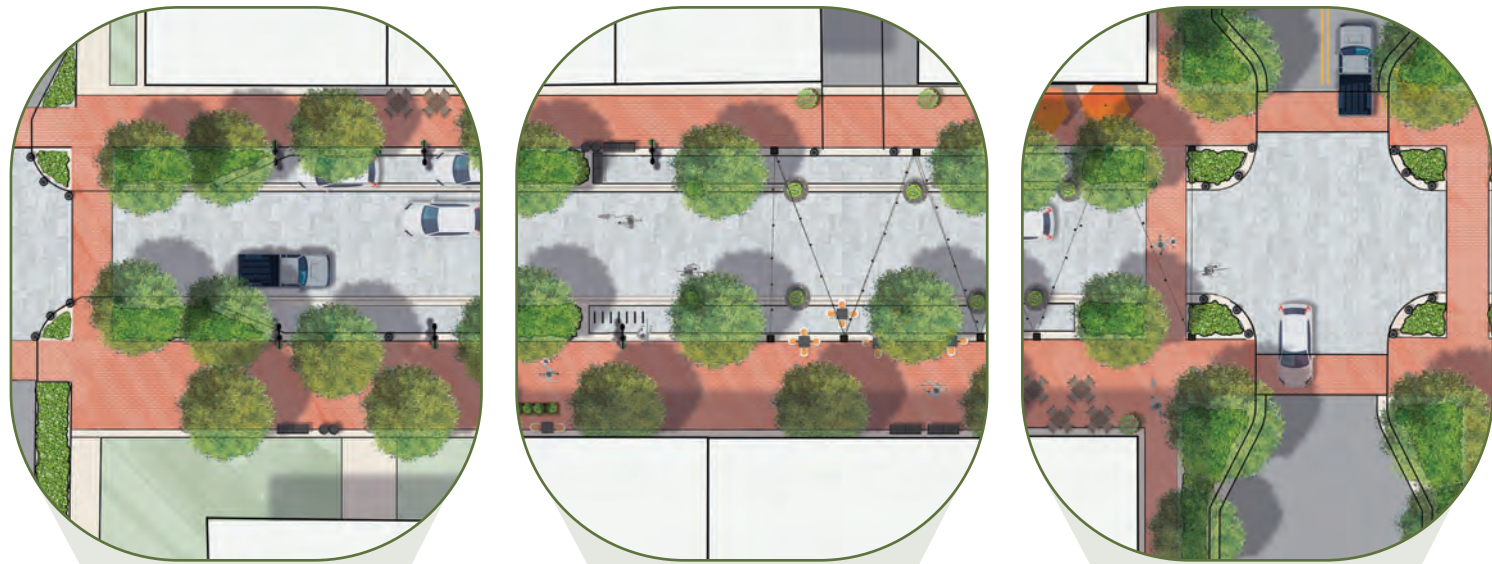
West St. James Street Streetscape Redevelopment - Typical Block Improvements
